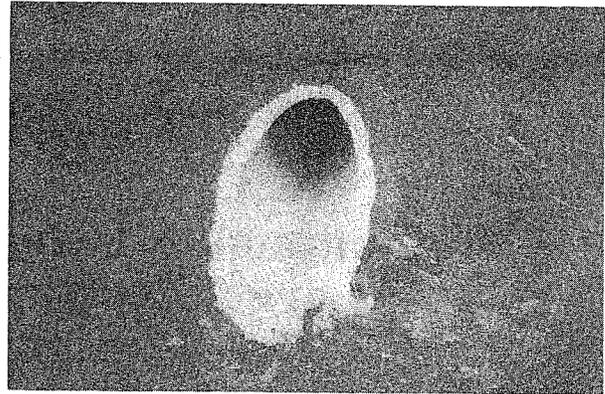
Finished culvert outlet on bottom of downstream face of Enid Dam
